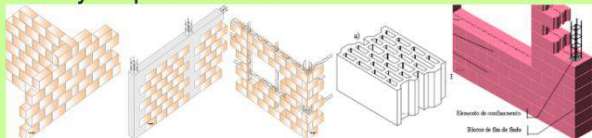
Scheme of Structures system in study with structural blocks: Simple masonry, confined masonry and reinforced masonry with prefabricated bed joint reinforcement or reinforcing steel bars with concrete infill
